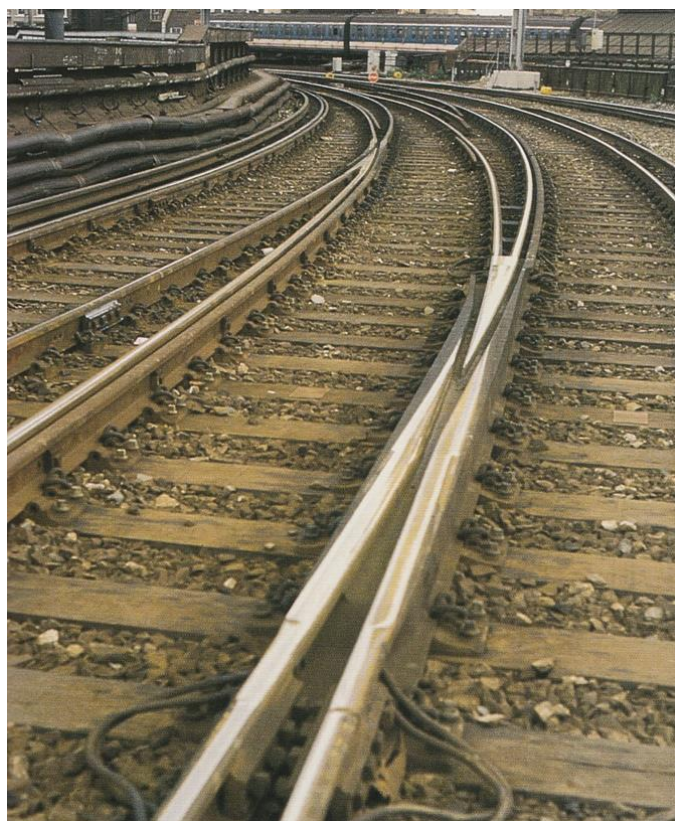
Fully Fabricated Crossing [3.2.52]
